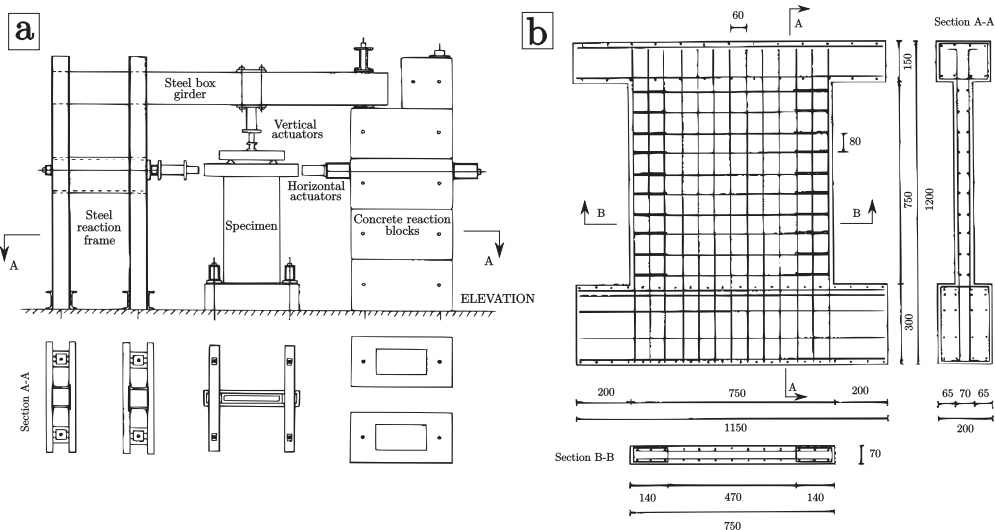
(a) Experimental set-up of the shear wall test by Lefas et al. [30] and (b) geometry and reinforcement detailing of the wall (images reproduced from Reference [30]).
